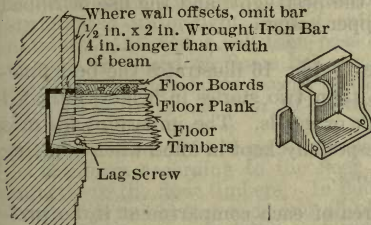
Detail of Cast-iron Wall Box for Floor Timbers.
